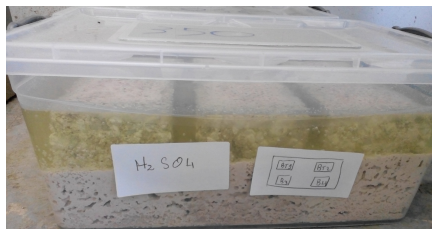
Concrete test cubes submerged in solution: H2SO4
